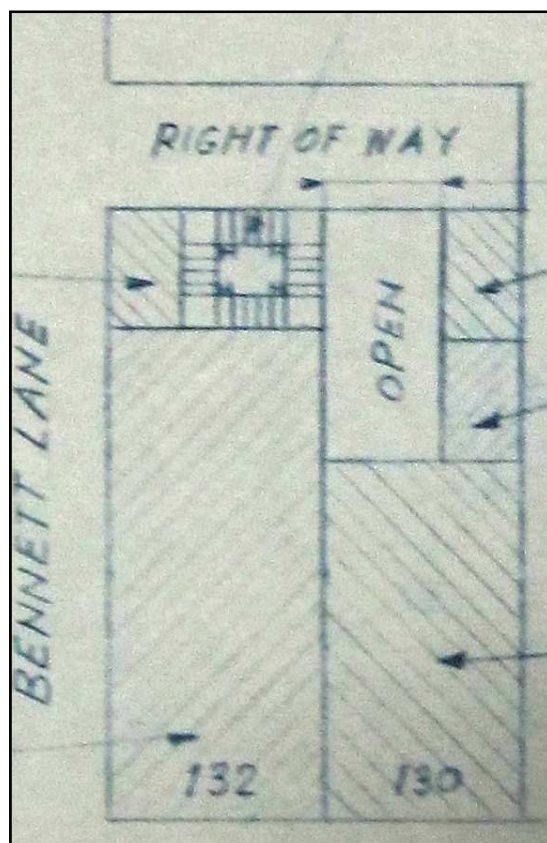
132 Lt Lonsdale St proposed stair 1980 (MCC BA51803)
